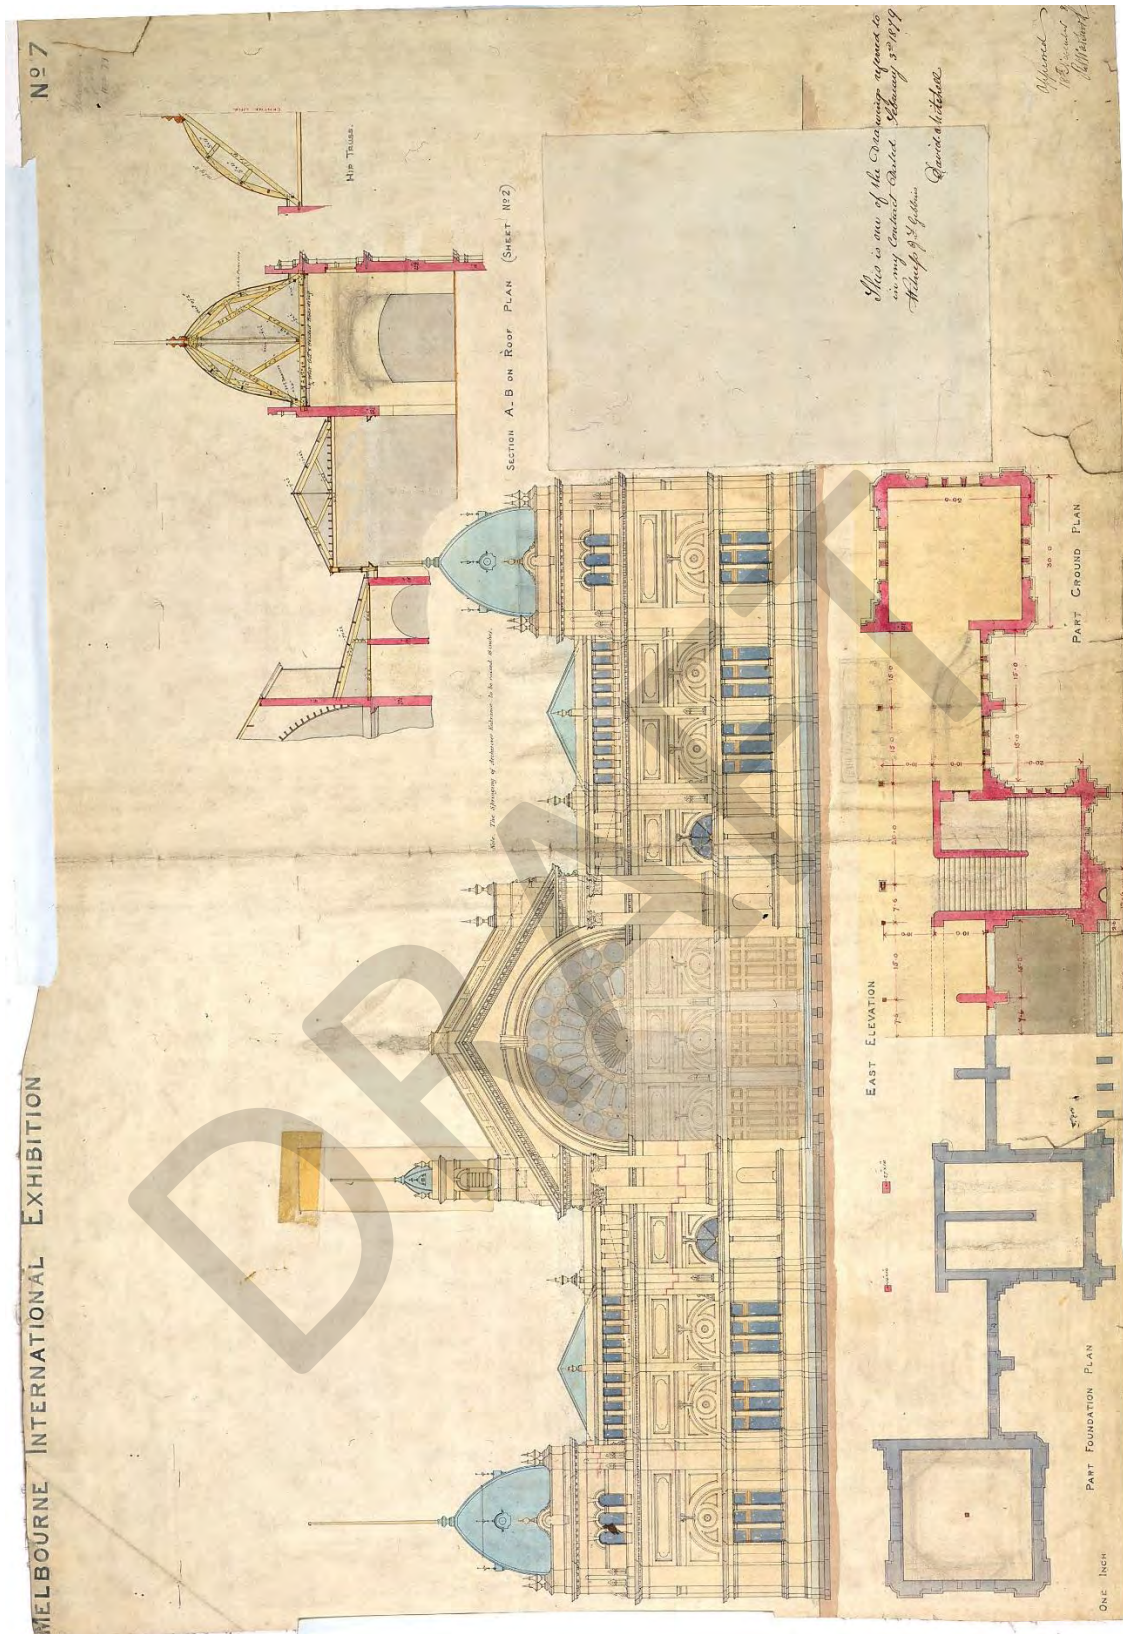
The Melbourne International Exhibition, east elevation, part foundation, part ground plan, & section A—B roof plan, 1879
